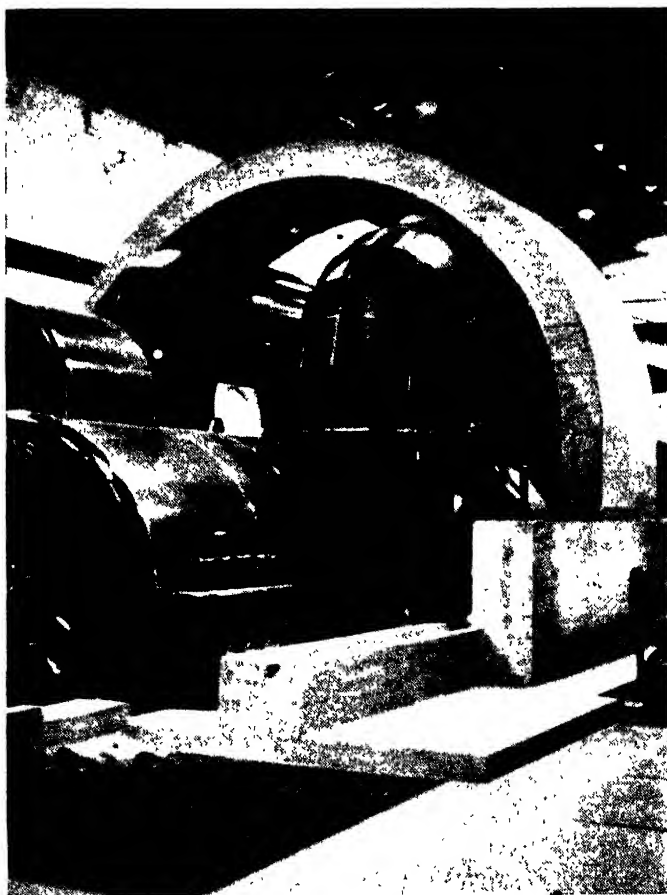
Reinforced Concrete Blast and Splinter Protection for 30 MW Turbo-Alternator (part erection).
